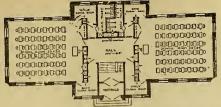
Floor Plan of Two-room Schoolhouse. By Mr. Arthur H. Buckley, Chicago, Ill.
